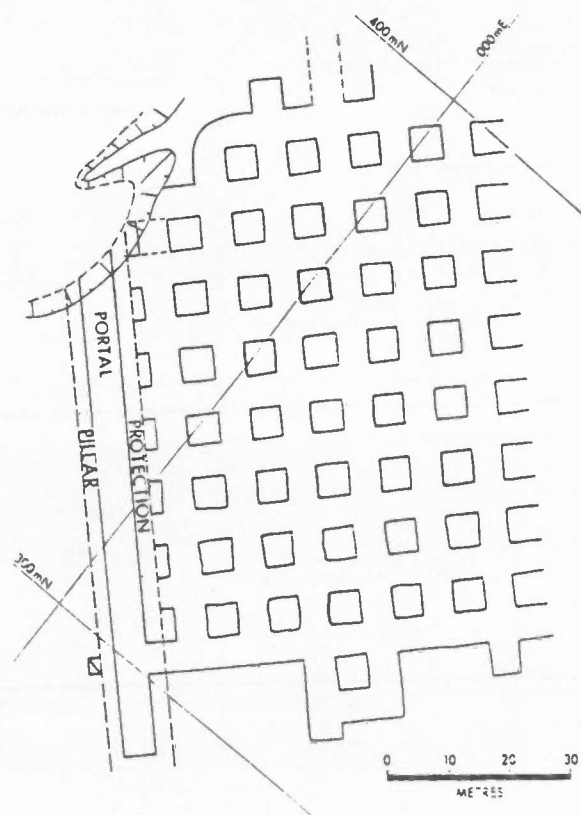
Pillar Layout Upper Zone Before Pillar Stripping
